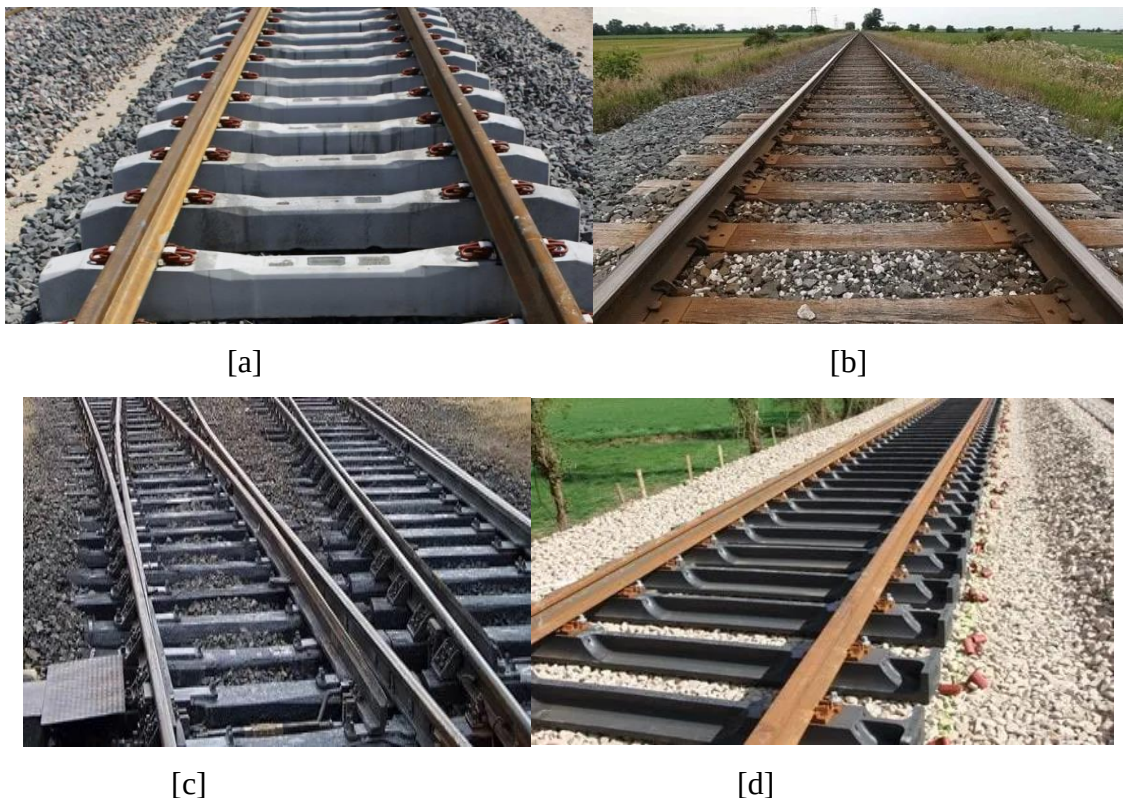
[a] Concrete sleeper, [b] timber sleeper, [c] steel sleeper, and [d] composite sleeper
